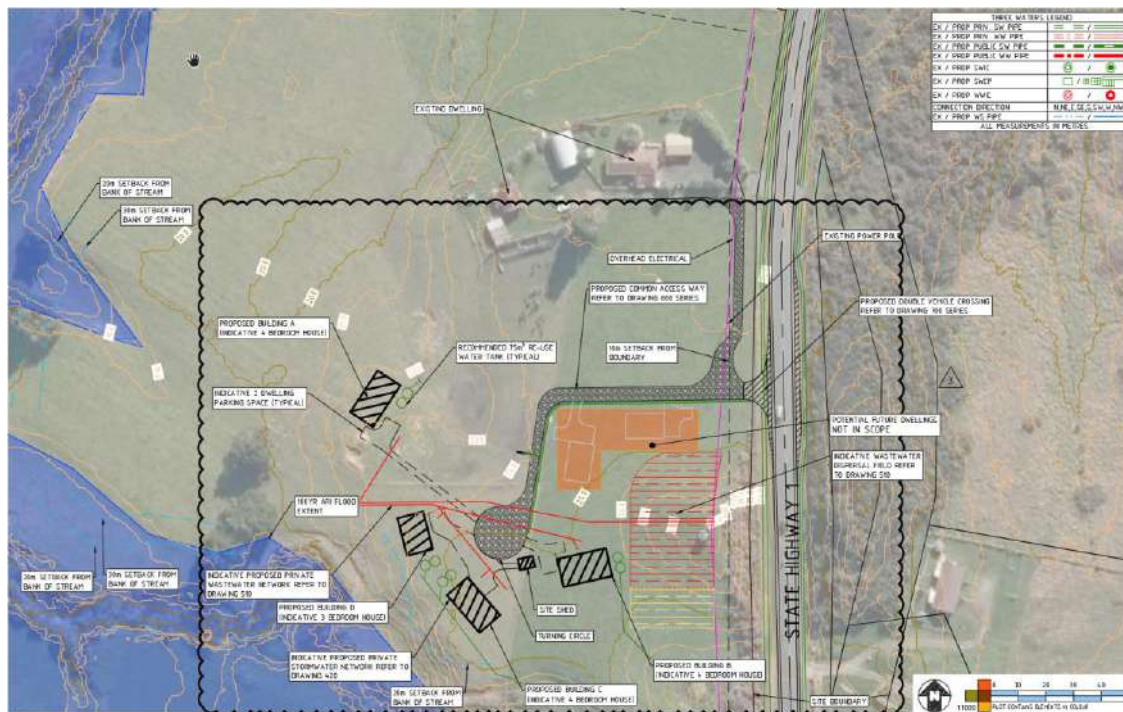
Proposed indicative site plan (Chester Consultants Limited)
